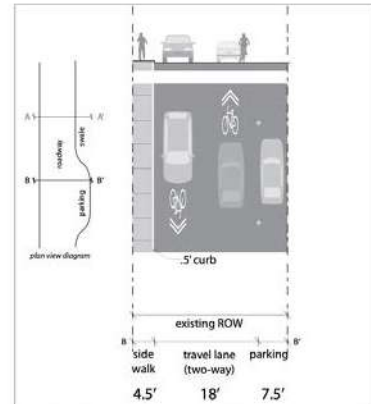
Neighborhood Street Expanded ROW - 30' ROW + Natural Drainage Section Cut B
